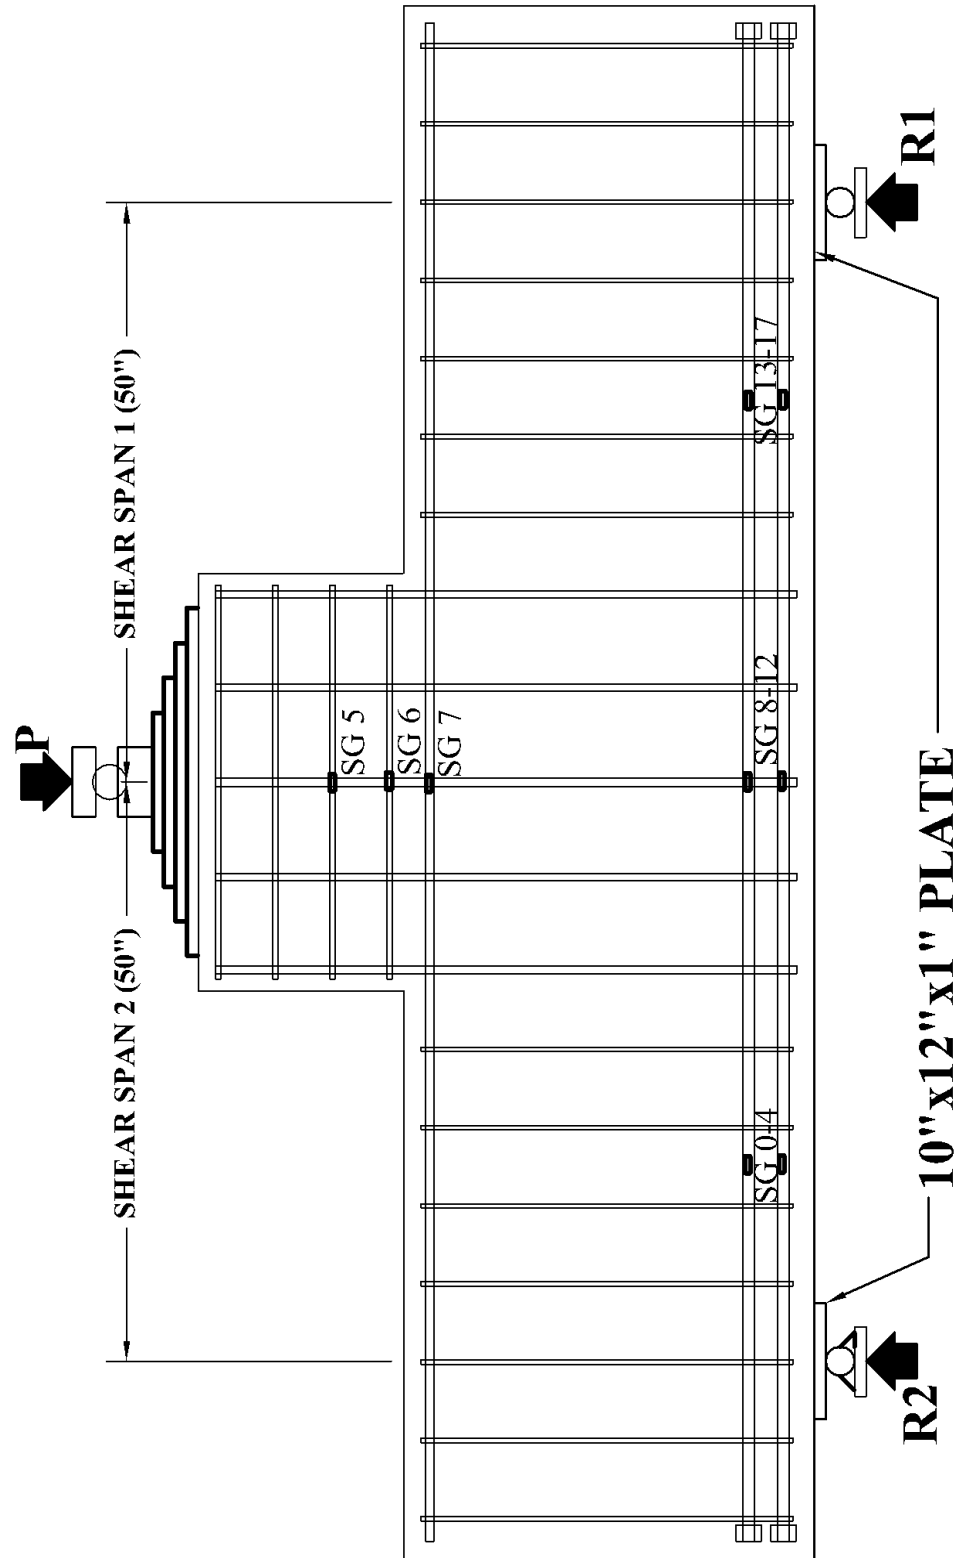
Location of strain gauges on reinforcement in specimens without internal shear reinforcement
